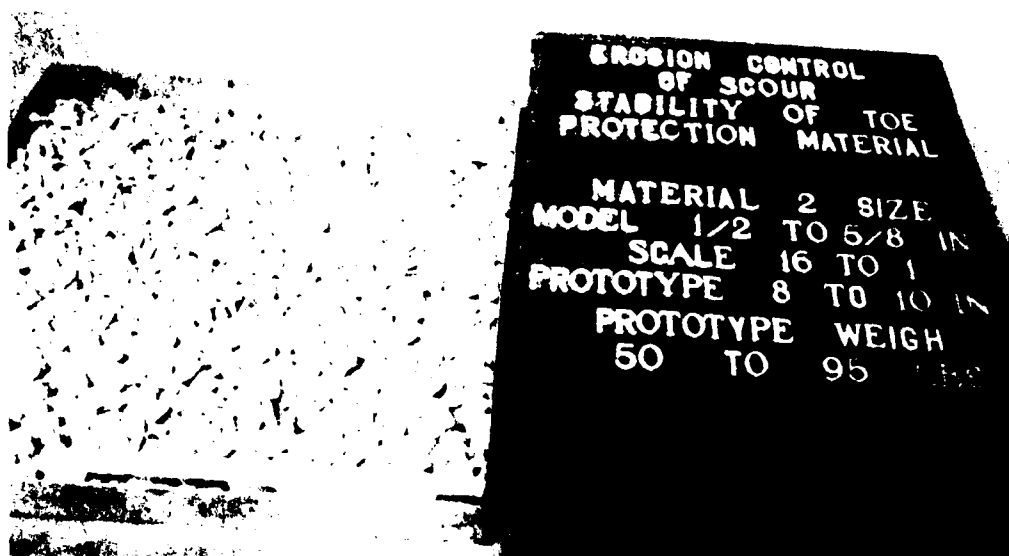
Underlayer test material 2, passing 5/8 in. and retained 1/2 in. model, 50 to 95 lb prototype ($W_{UL} = 72$ lb prototype), 9-in. prototype size
